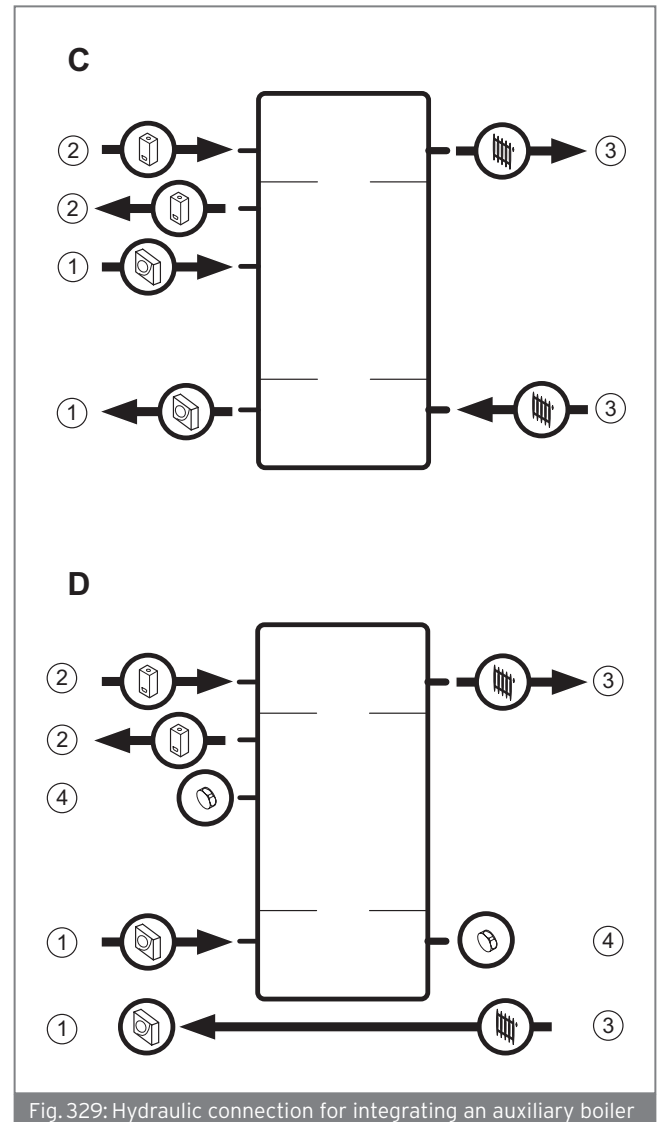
Hydraulic connection for integrating an auxiliary boiler
